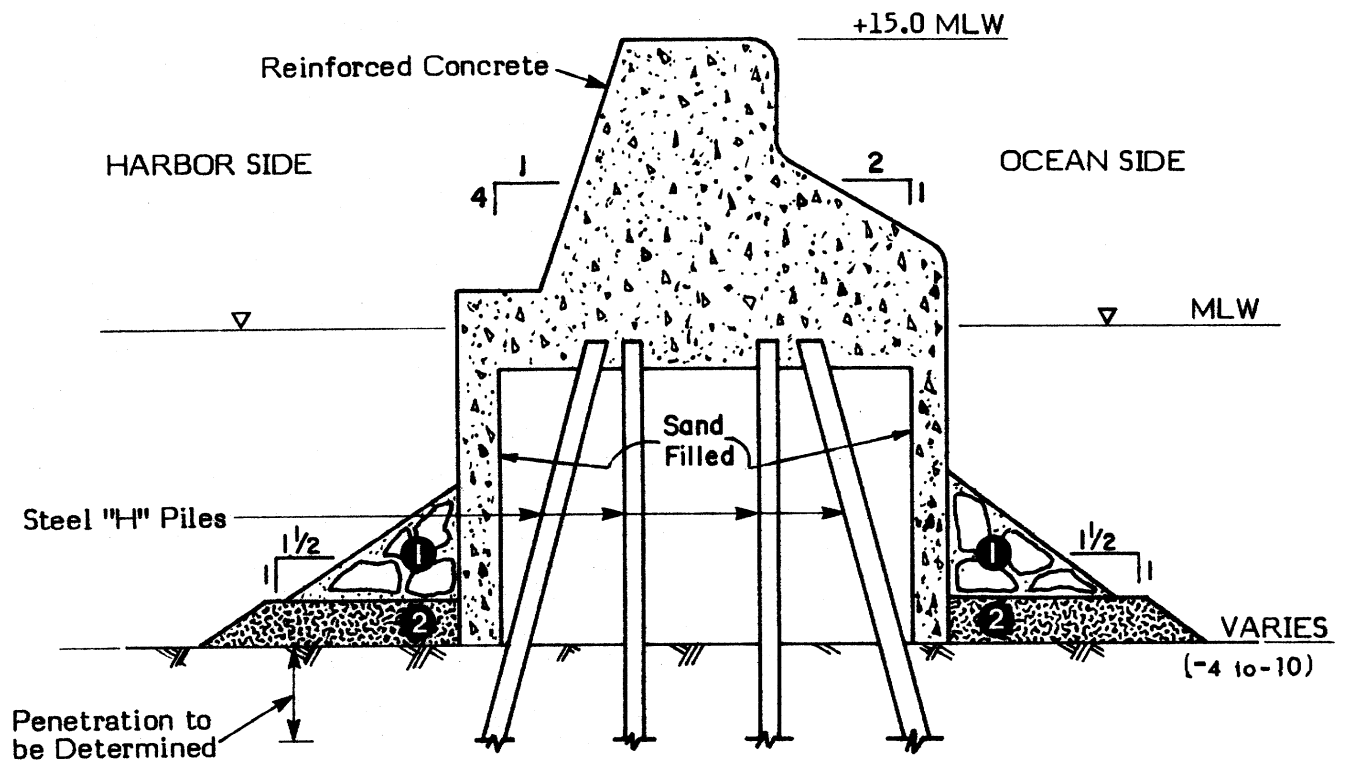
shows a schematic design of a concrete composite slope breakwater that is feasible for the protection of Black Rock Harbor. The shape is designed with a hollow core to limit concrete requirements and to reduce foundation loads. Support is provided by deep driven steel H-piles beneath the structure. The composite slope of the face is shaped to provide for rapid breaking waves and to limit overtopping. Again, 2-ton stone or armor units are to be used for toe protection and a crest elevation of at least 15 ft is recommended from stability considerations.
